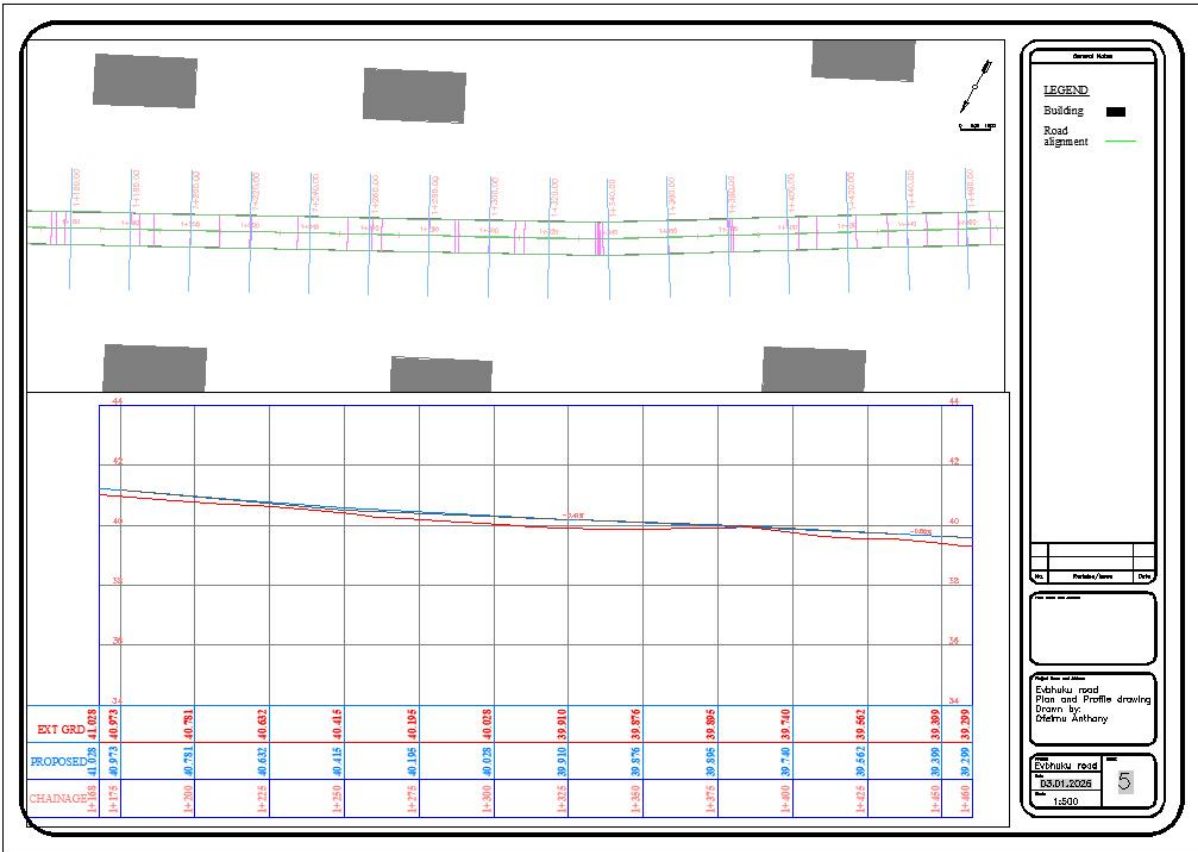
Plan and Profile Drawing (1+168 – 1+460)
